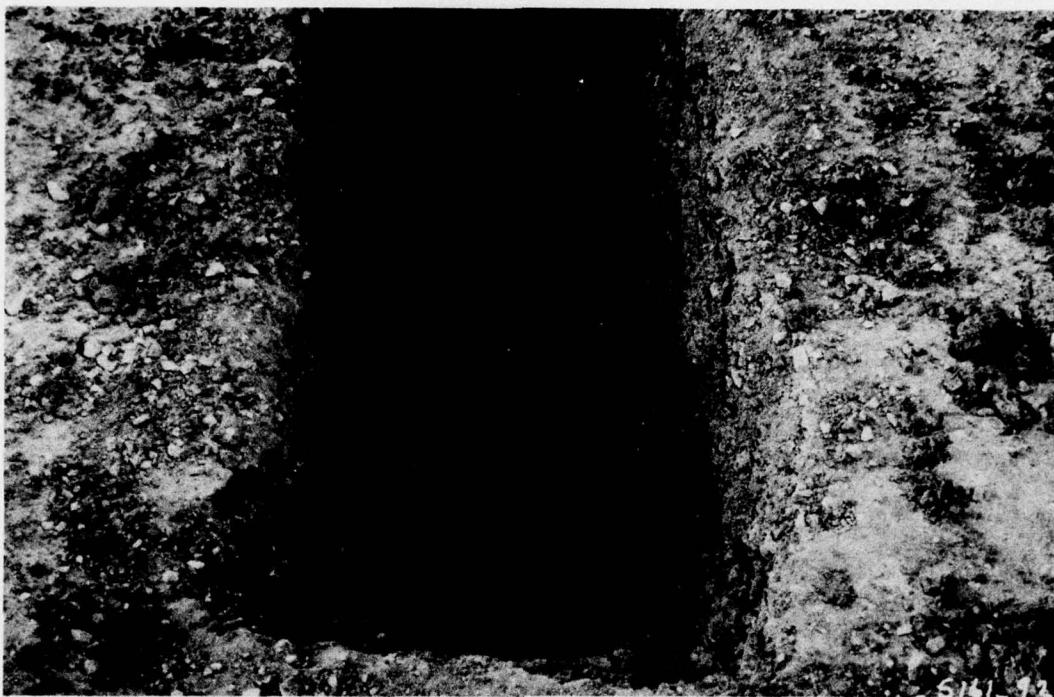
Trench in Test Section No. 4, item 1, showing condition of membrane after 480 passes
